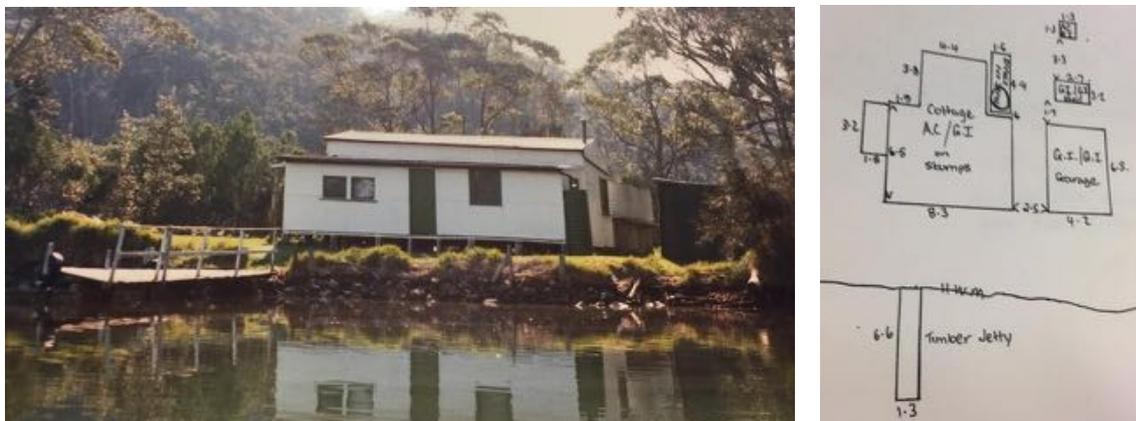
Lot 2 – PO 1967/13 Photo and plan by Department of Lands. (NSW Department of Industry, Lands & Water Division)
